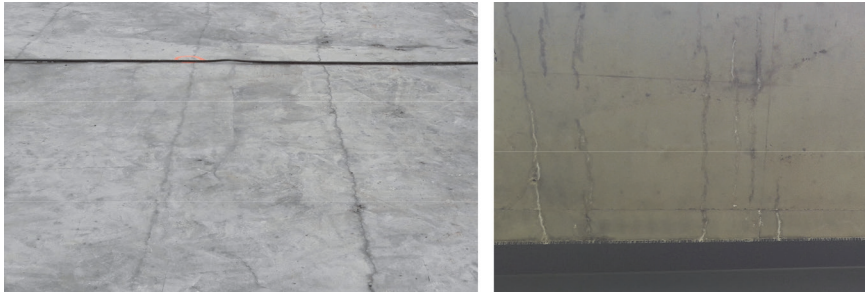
Example of cracks in deck slab of composite bridge to be avoided
